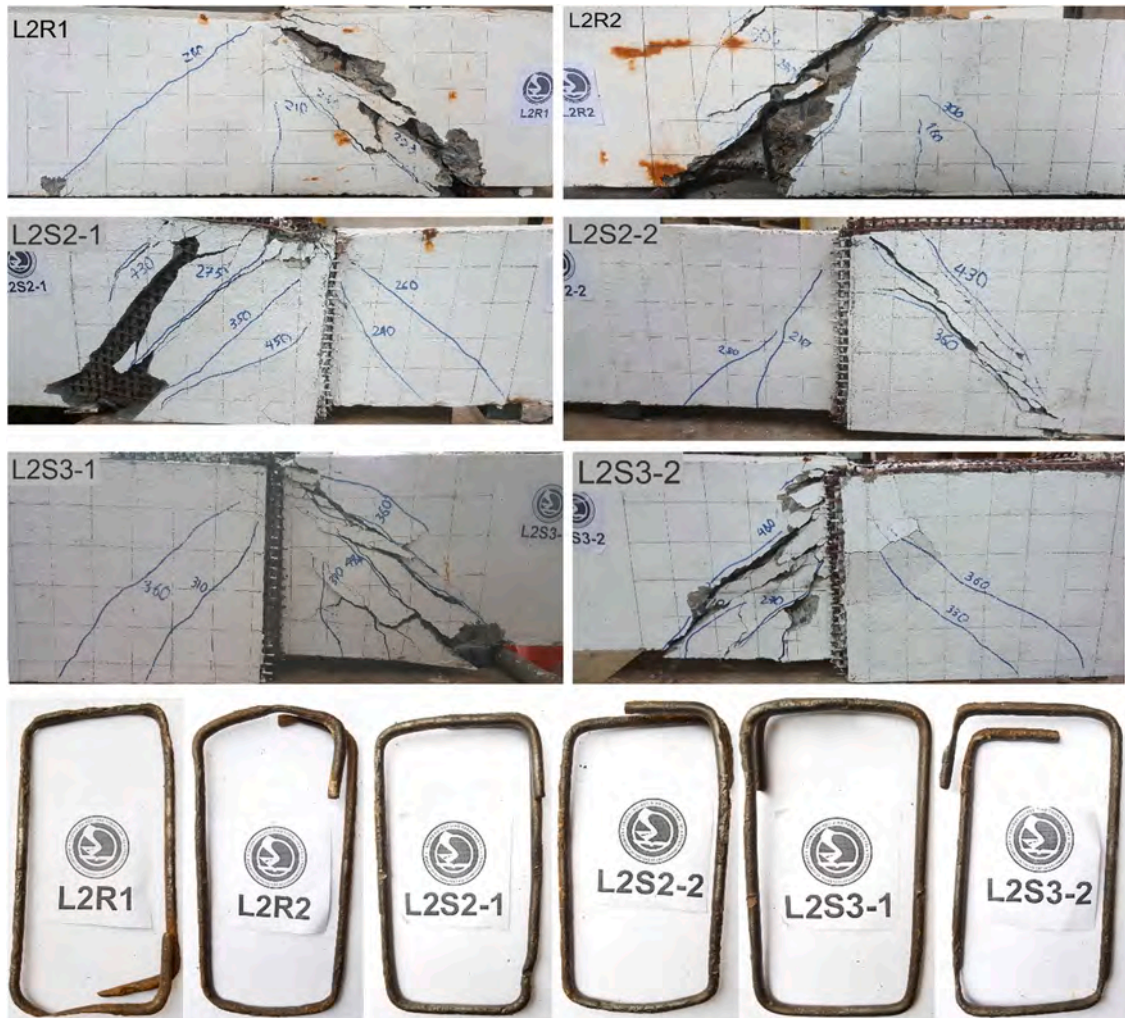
Crack patterns of corroded beams in 3rd group and the extracted-corroded stirrups.
